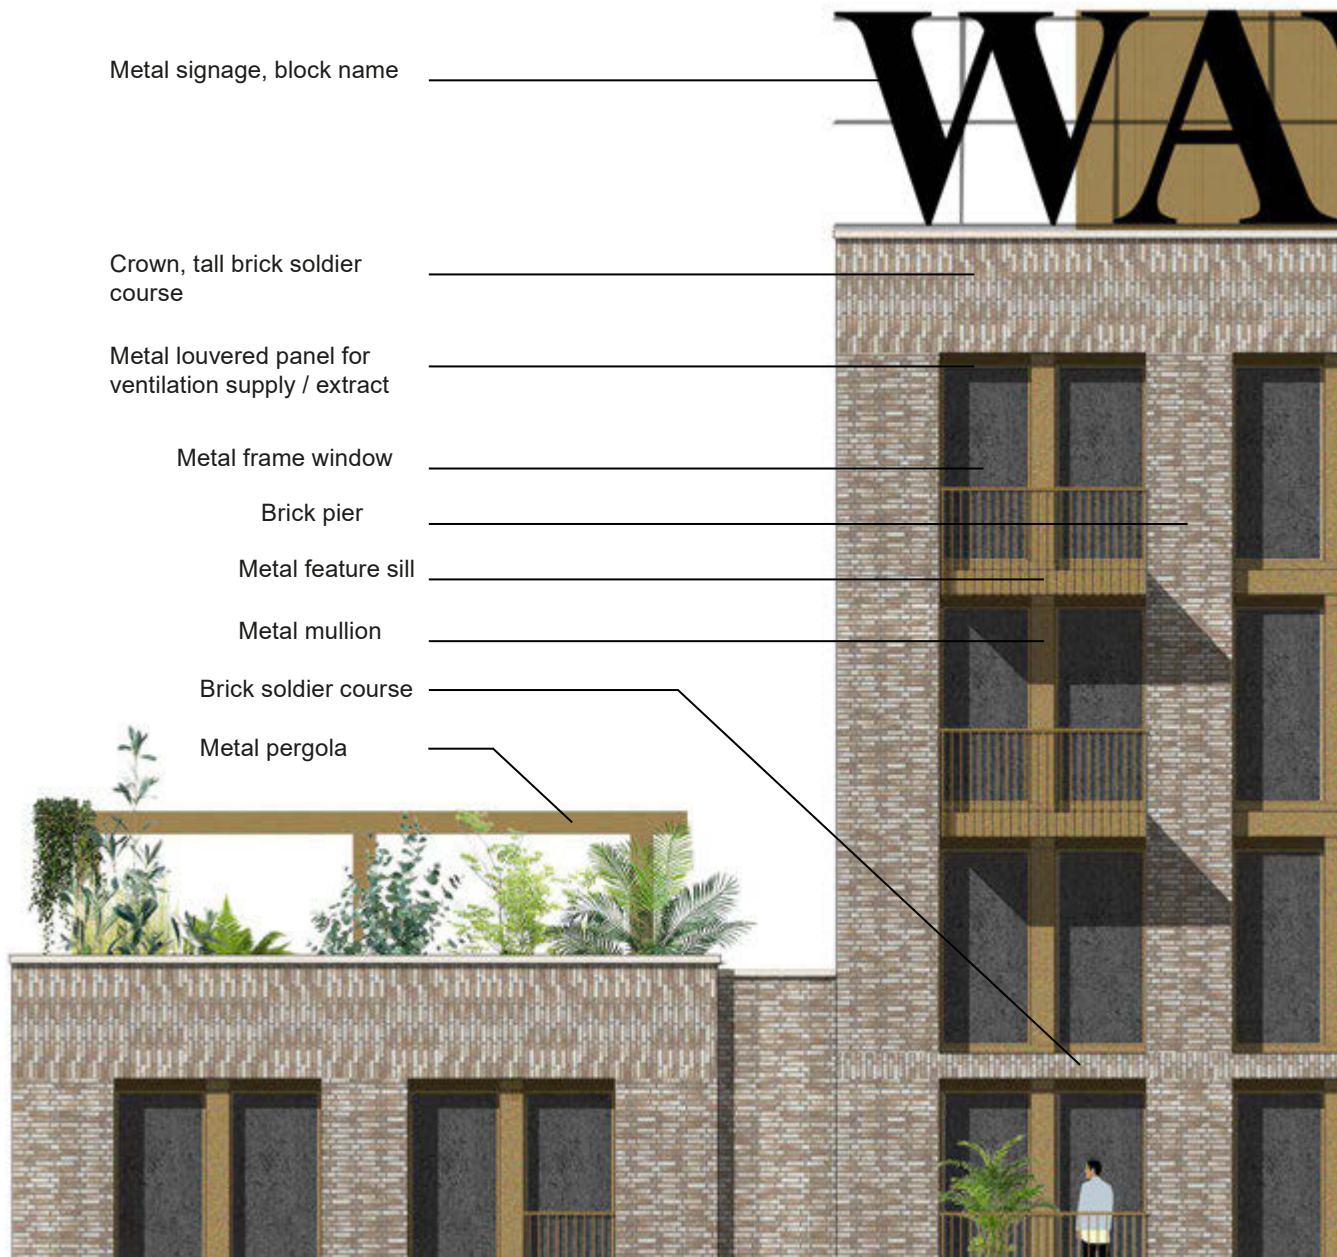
Illustrative fragment Elevation - West Block B
